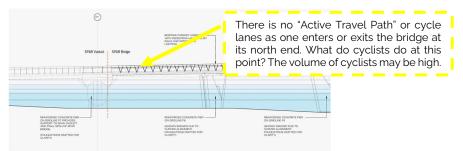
Excerpt from 'SPAR Bridge Proposed North Detail Elevation' (Source: Dwg. No. MOXON-SBR-SP-DR-A-100-00012)
